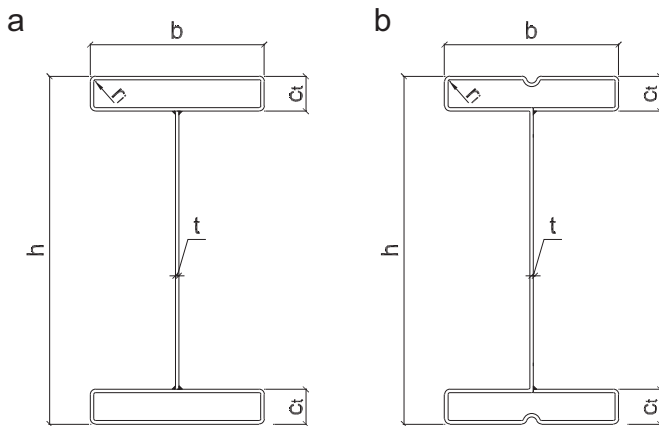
Geometry of: (a) tested section and (b) optimised section.
